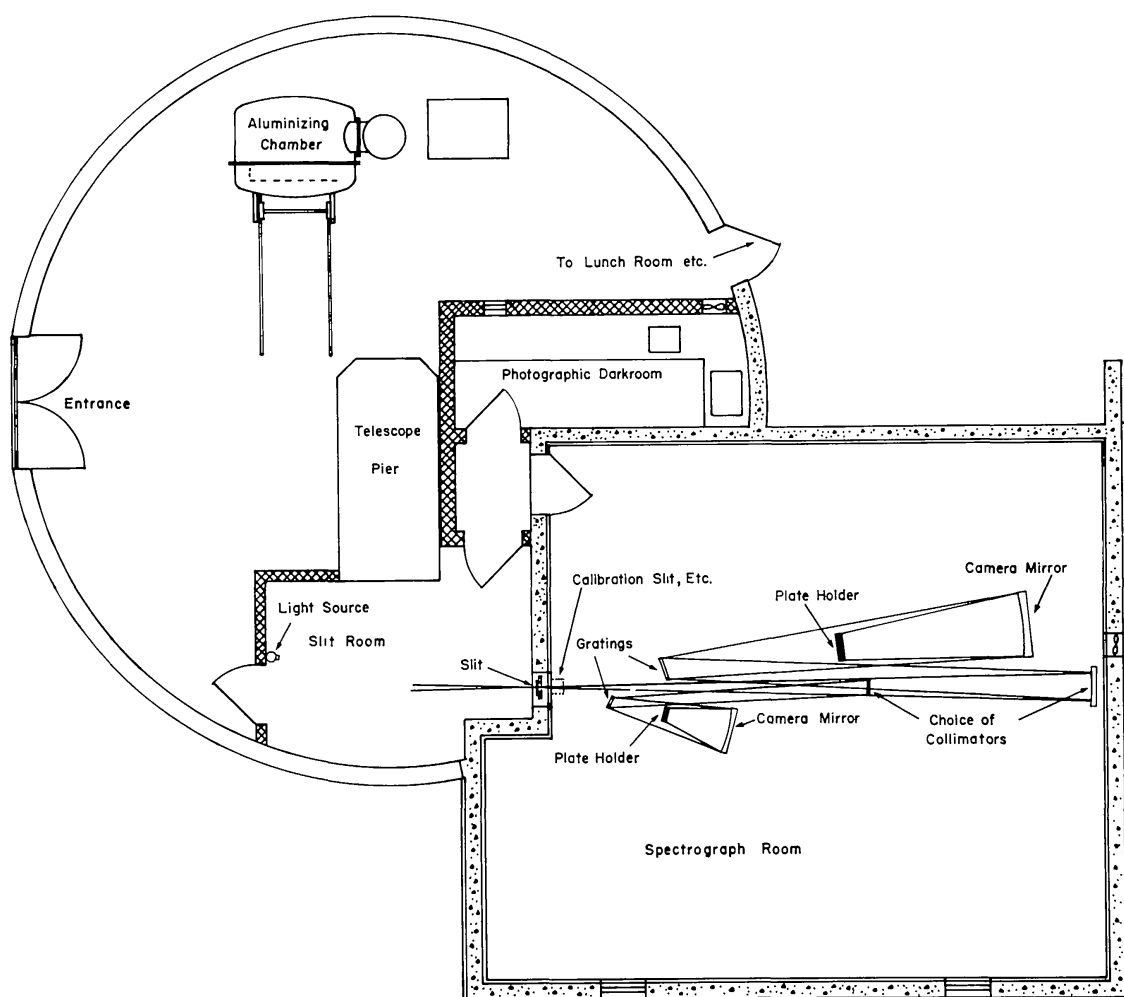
Floor plan of the dome and coude room of the 48-inch telescope.
